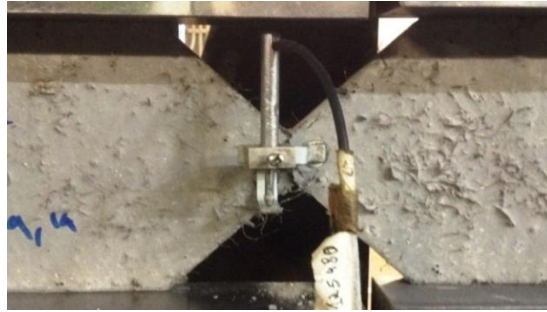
The position of the LVDT to measure sliding of the shear crack at notched section
